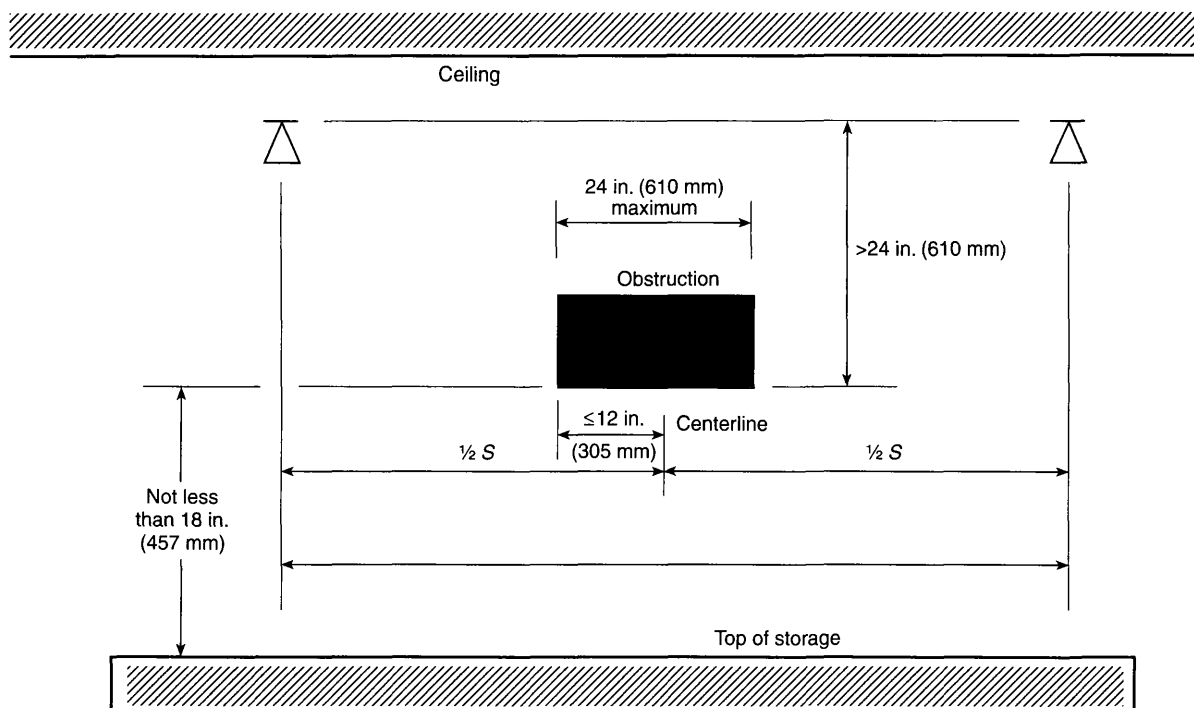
Obstruction More Than 24 in. (610 mm) Below the Sprinkler (Large Drop Sprinkler).
